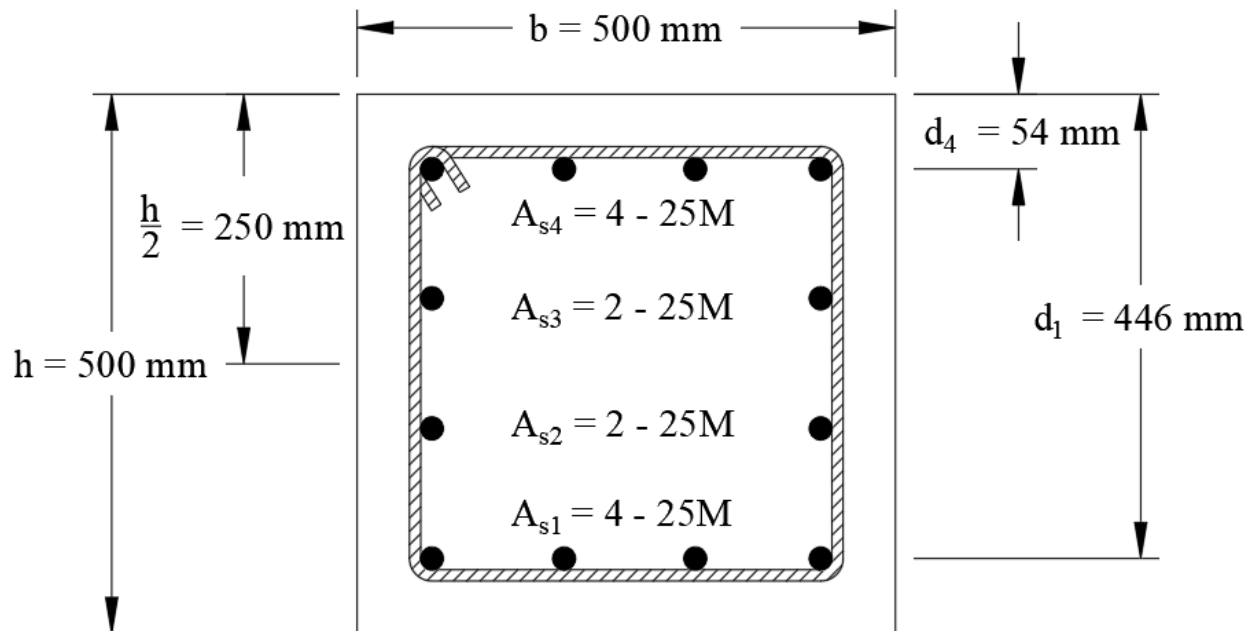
Slender Reinforced Concrete Column Cross-Section
